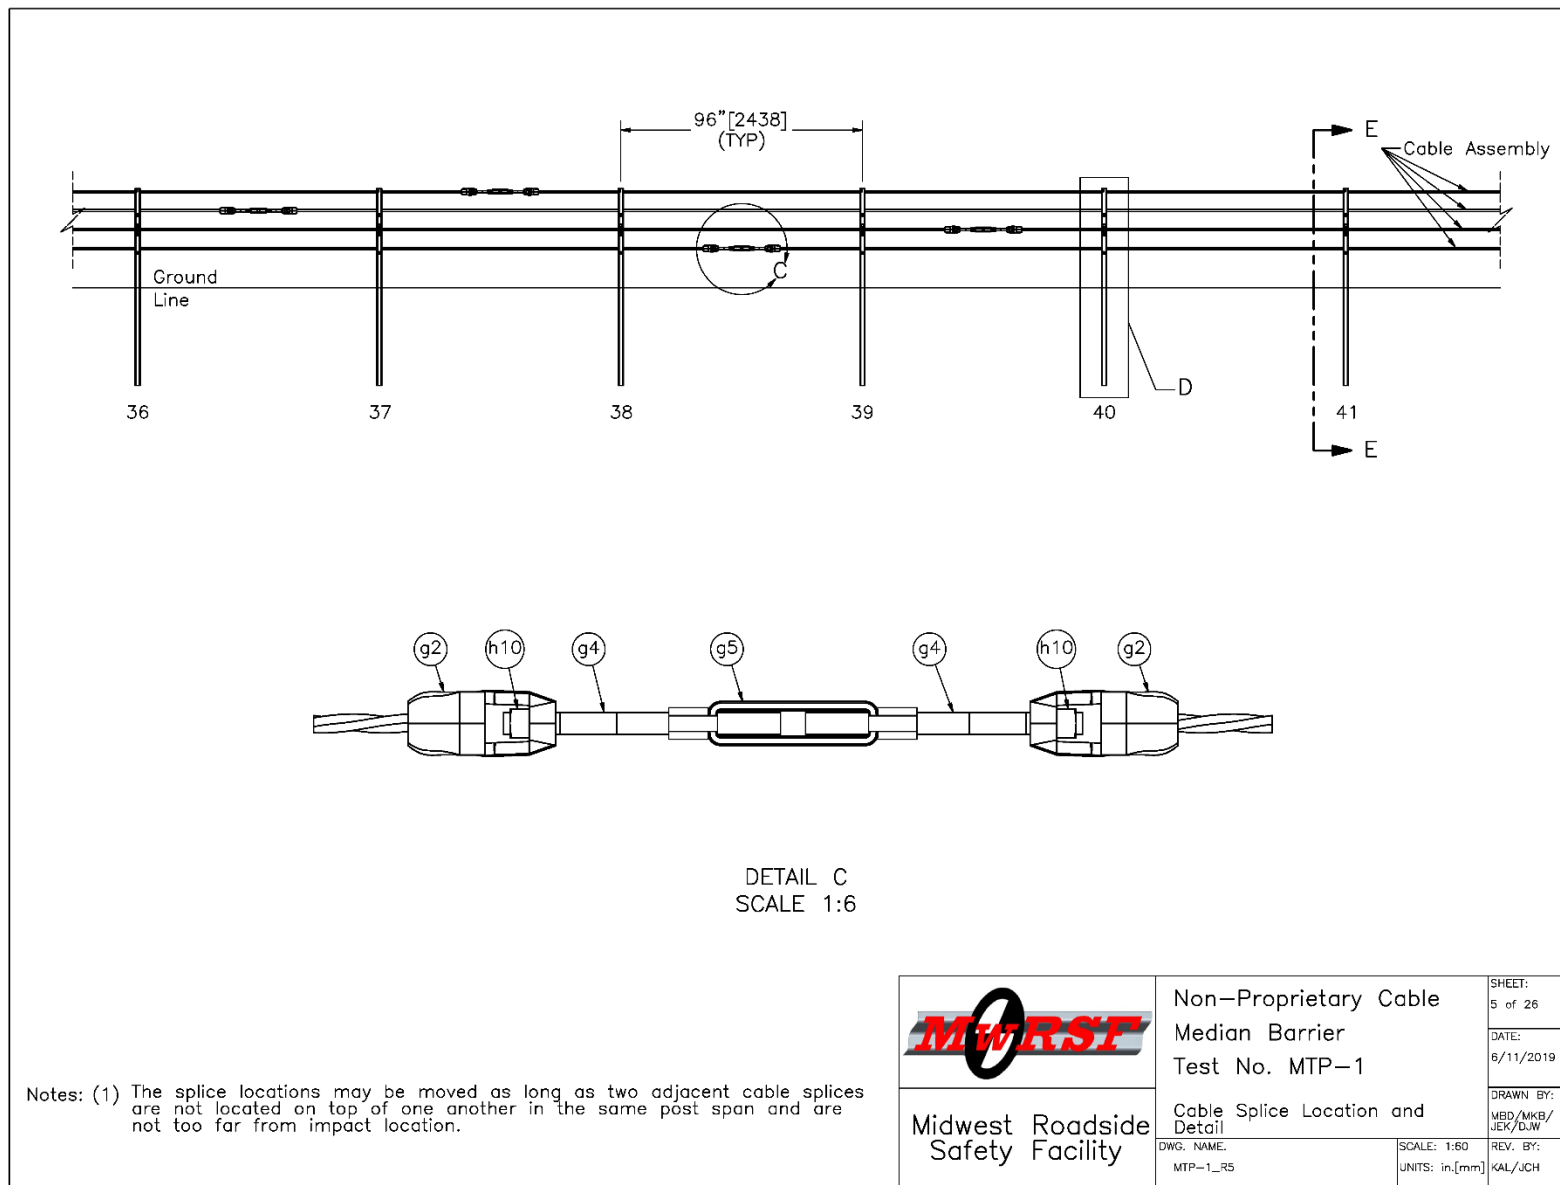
Cable Splice Location and Detail, Test No. MTP-1
